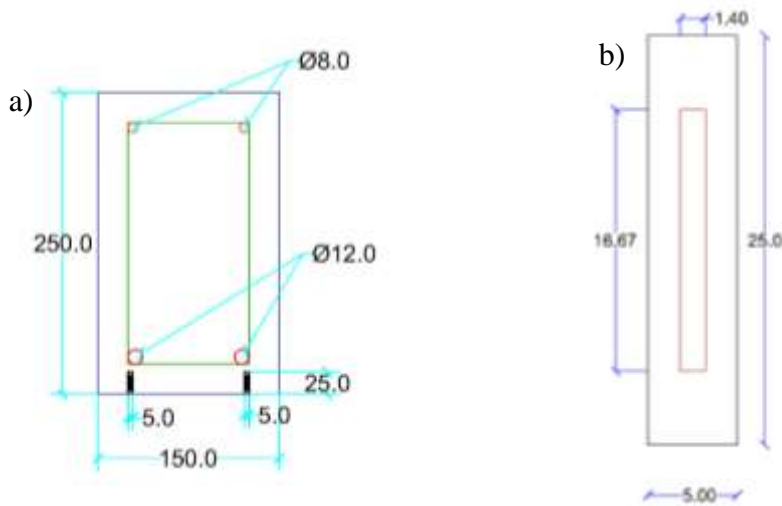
Detail of cross-section and groove for a beam with NSM-CFRP strip (all dimensions in mm).
